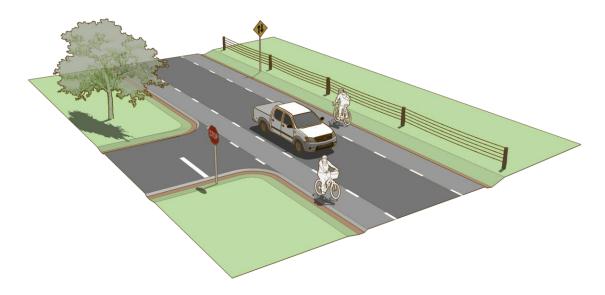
A walking and biking shoulder (Source: Small Town and Rural Design Guide, 2023).
